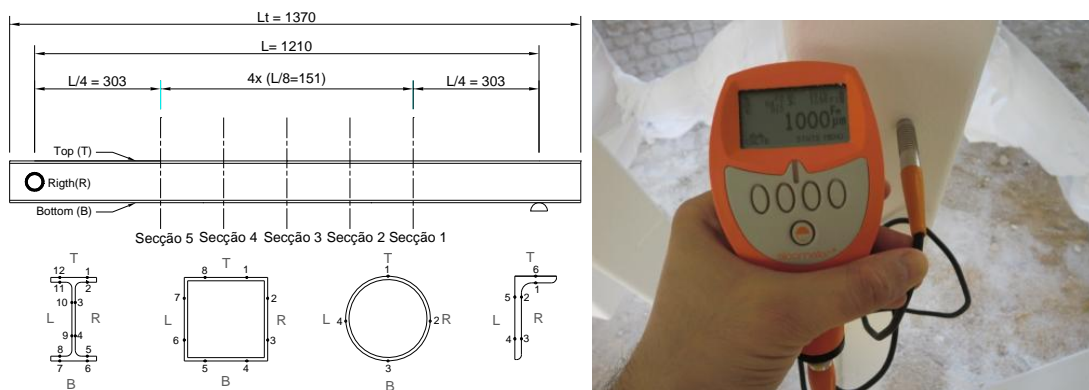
Cross section thickness measuring points locations. Dry film thickness measuring device.
